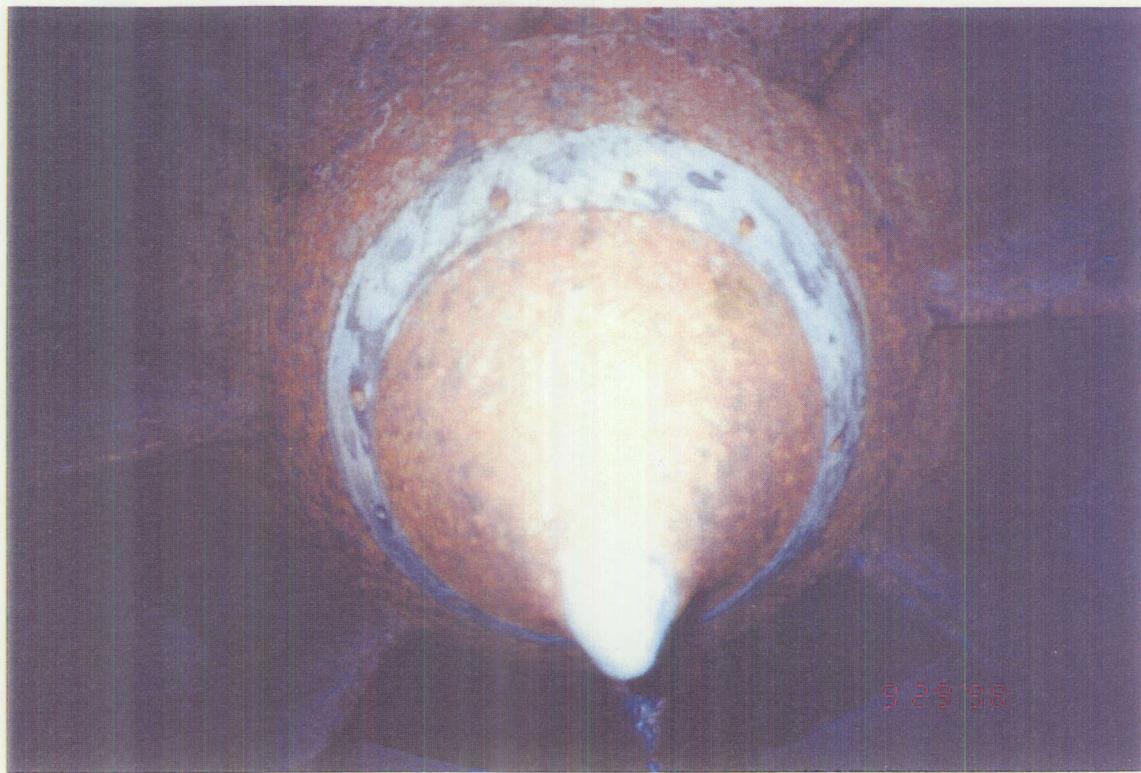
Morris Dam - Needle Valve 1 - View of corrosion on upstream body tip, bronze body tip ring, and valve body.
